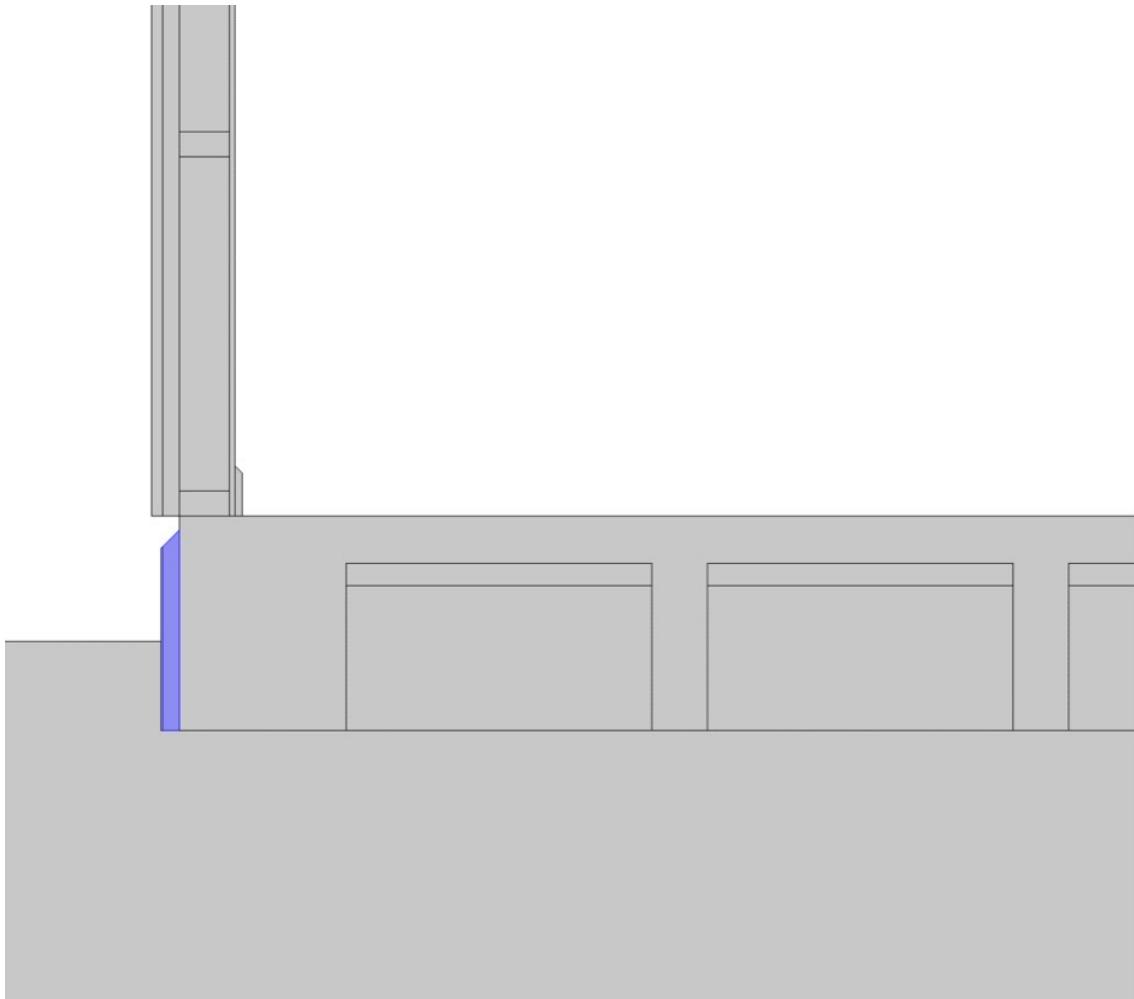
Configuration B: A waffle pod foundation and timber-framed wall, with perimeter insulation added to the exterior side face of the slab.
